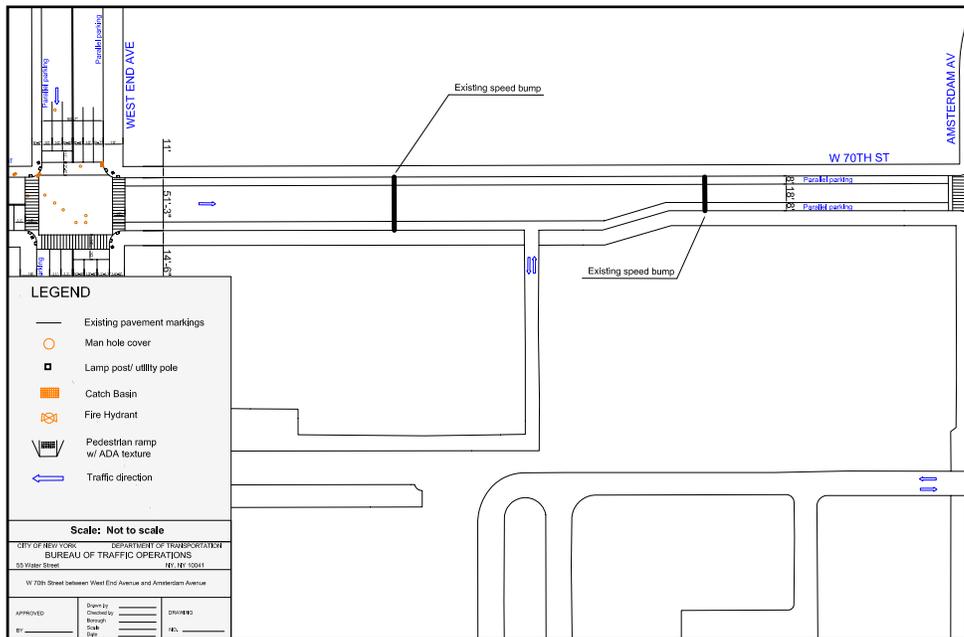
Existing conditions on West 70th Street between Amsterdam Avenue and West End Avenue
